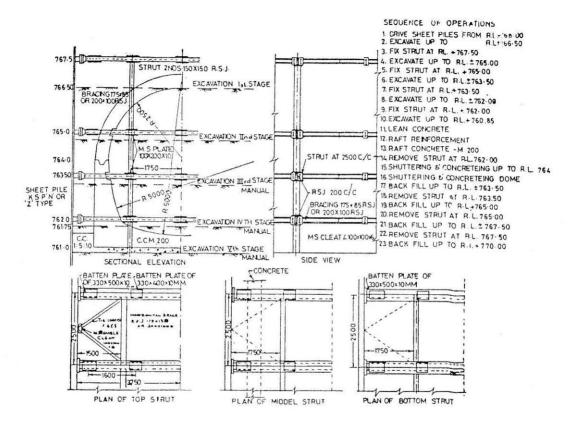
Construction of Cut and Cover Section, Sequence of Operations Loktak H.E. Project.
